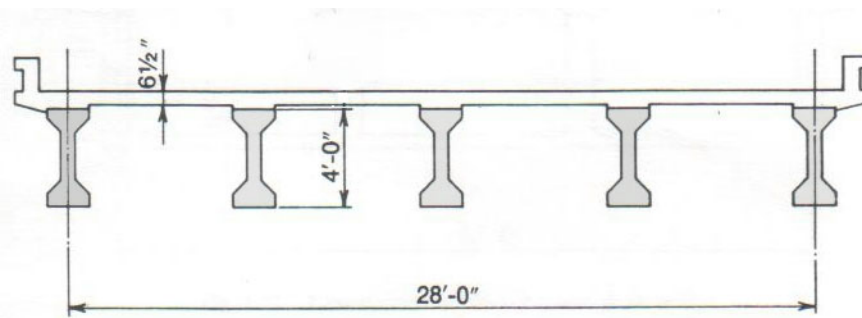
Typical Pre-cast “I” Girder/Beam Bridge Section
